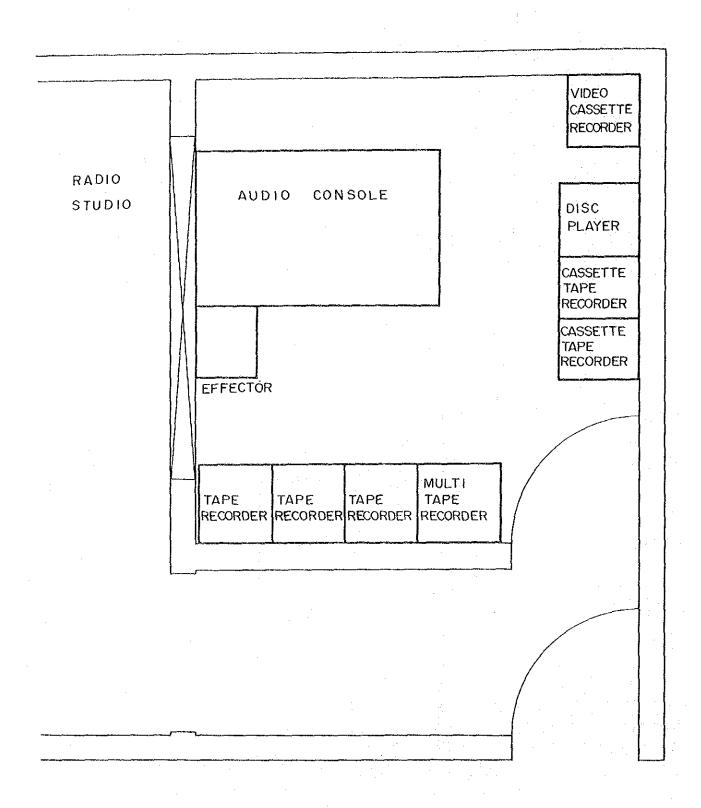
FLOOR LAYOUT OF AUDIO / DUBBING STUDIO (1:30)
